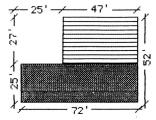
Scaled building moved to another drawing area and dimensioned.
